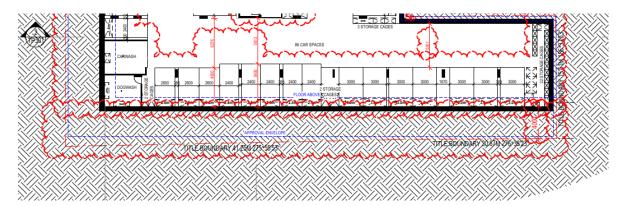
Excerpt of Amended Basement Level 1 Plan (Point Architects)
